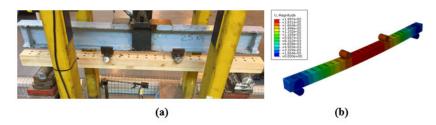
AFLT beam: (a) Experimental setup and (b) Finite element modelling
